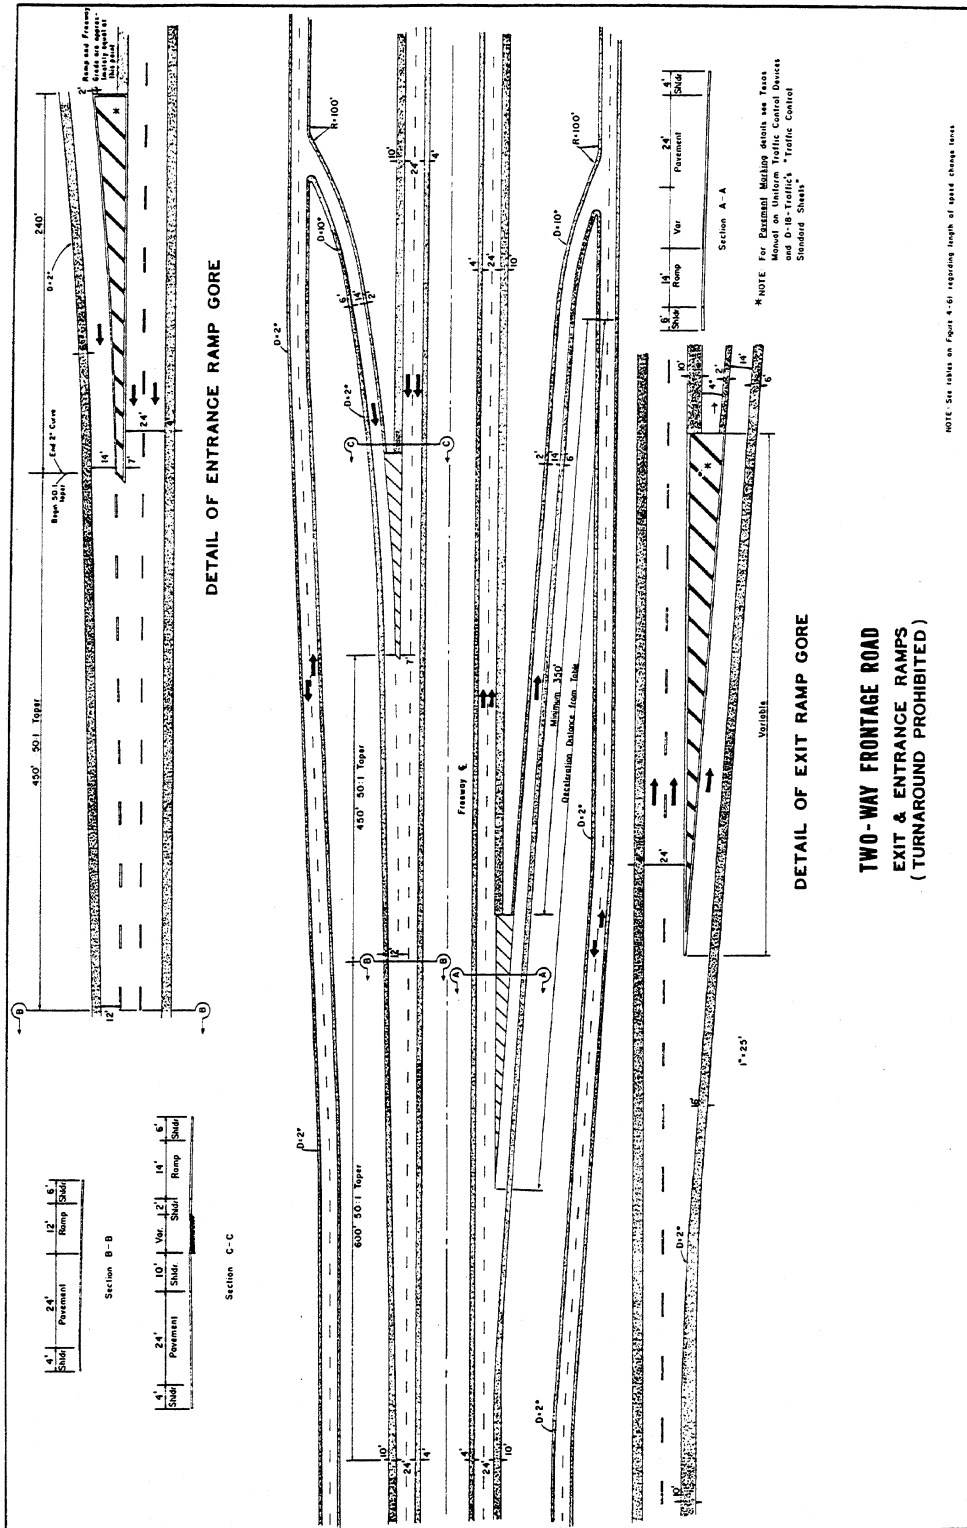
TxDOT two-way frontage road ramps without turnaround
